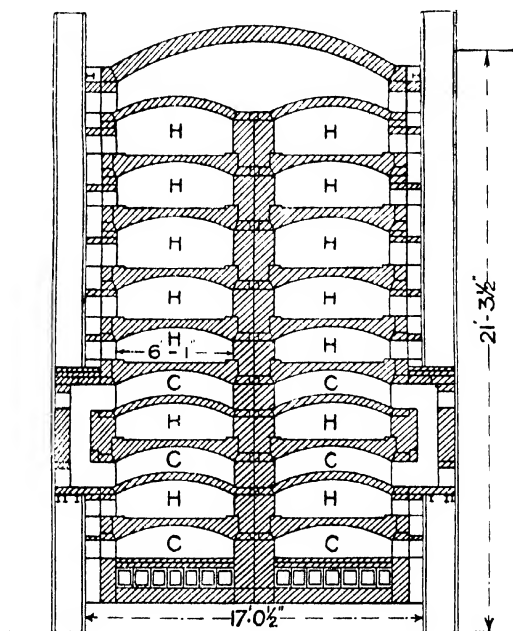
HEGELER ROASTING FURNACE. SECTIONAL ELEVATION
